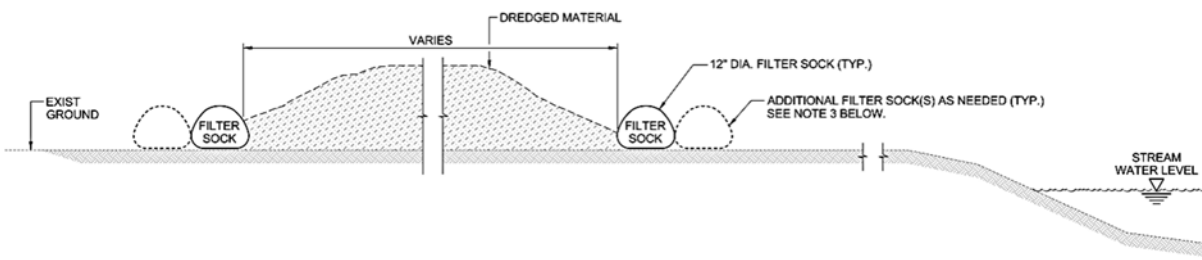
Perimeter Barrier to be Installed Around Dredge Material Stockpiles
